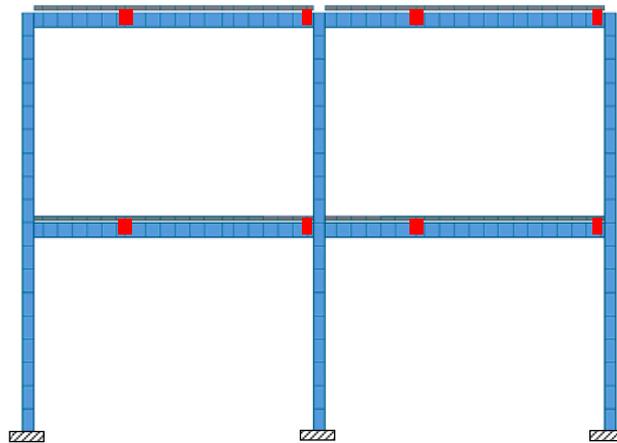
location of the plastic hinges at failure of “Frame A” of the “UK” building
